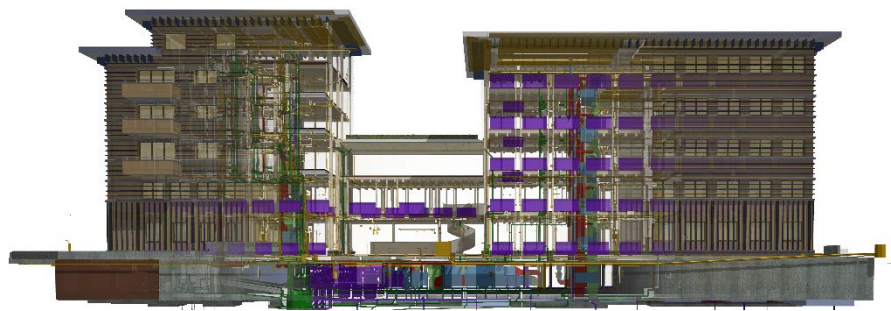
Haus des Holzes, PIRMIN JUNG Schweiz AG (source: cadwork)
